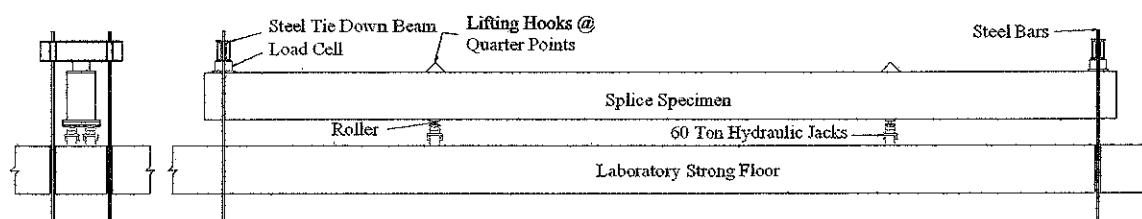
Illustration of Test Setup for No. 20 Splice Specimens
